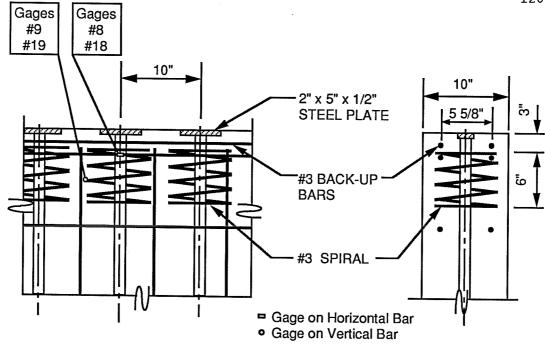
Slab #6 Spiral Detail @ Anchors E & F
